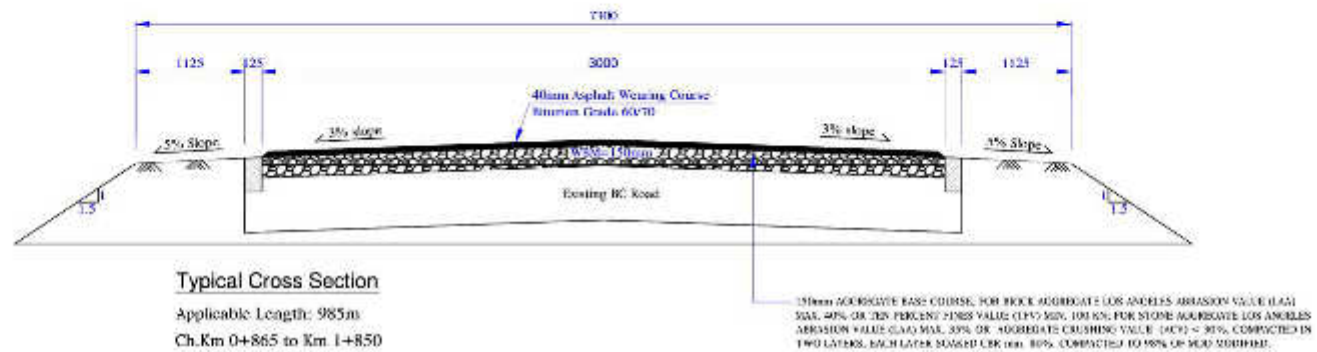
Typical Cross section of the Road (Ch. 0+865 - 1+850 km)
